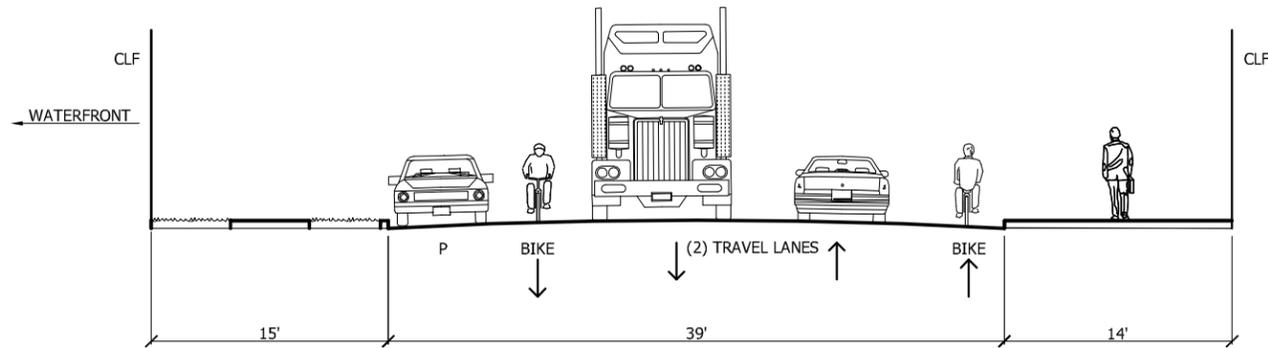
Existing configuration on Franklin Street from Quay Street to North 14th Street along east side of Bushwick Inlet Park
